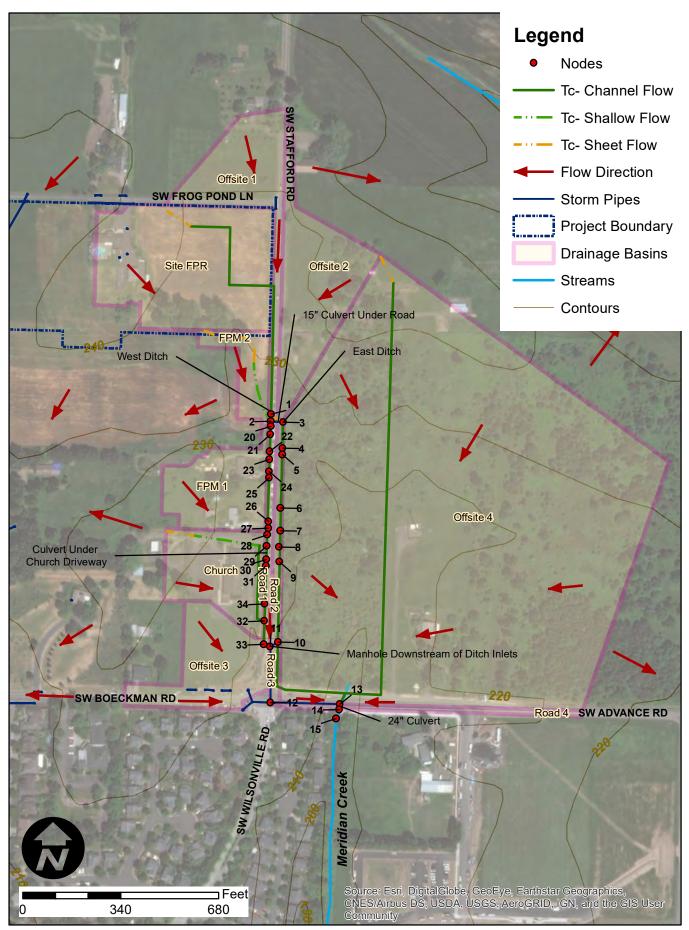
C. Frog Pond Ridge Downstream Analysis, Full Buildout Conditions
